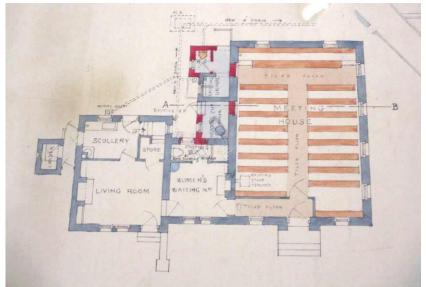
Plan of proposed south extension to meeting house 1920s/1930s (Brotherton Library, Special Collections, MS/DEP/1979/1/RAW/1/41 – DD2/10)
